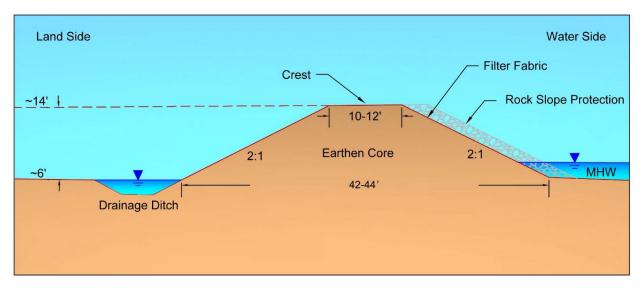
Typical dike features, drainage ditch, earthen core, 2:1 slopes, crest height equal of 14 feet (MAMW elevation by 2100) width for vehicular access, and rock slope protection.
